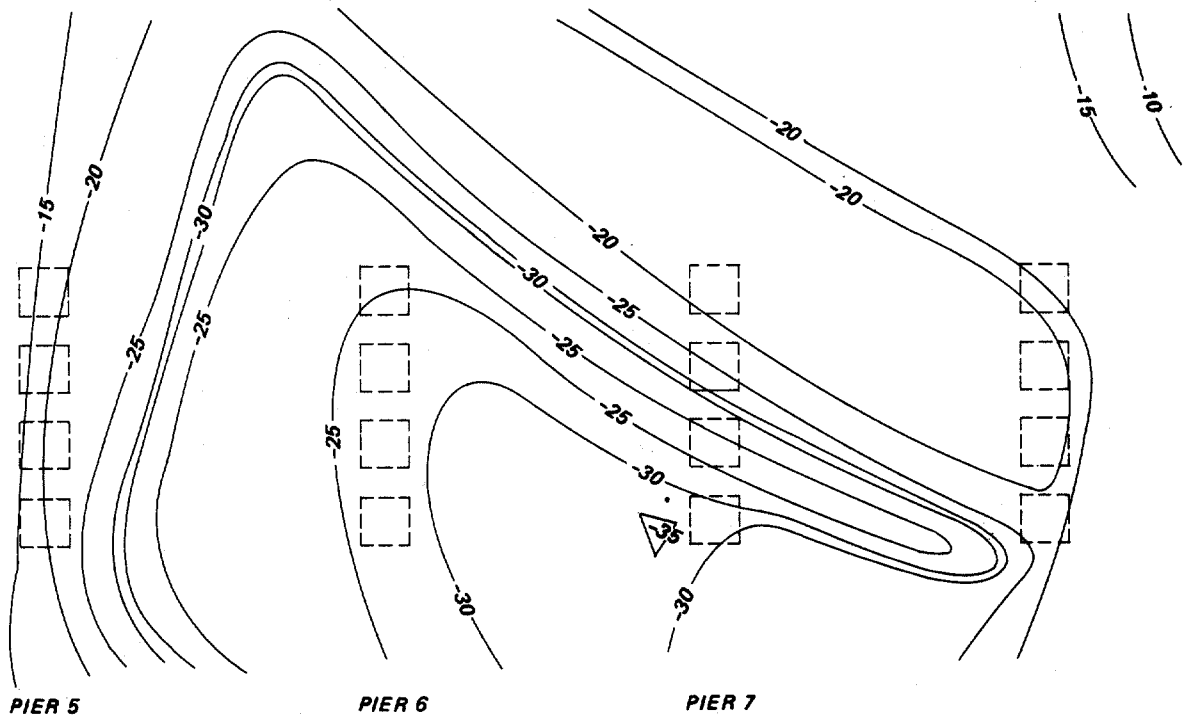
Contour map showing pattern of local scour at piers 5, 6, 7, and 8, I-5 bridge at Steamboat Slough. Soundings in feet, taken March 2, 1976.
